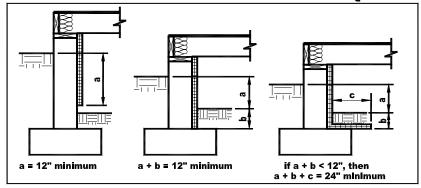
CRAWL SPACE WALL INSULATION REQUIREMENTS
